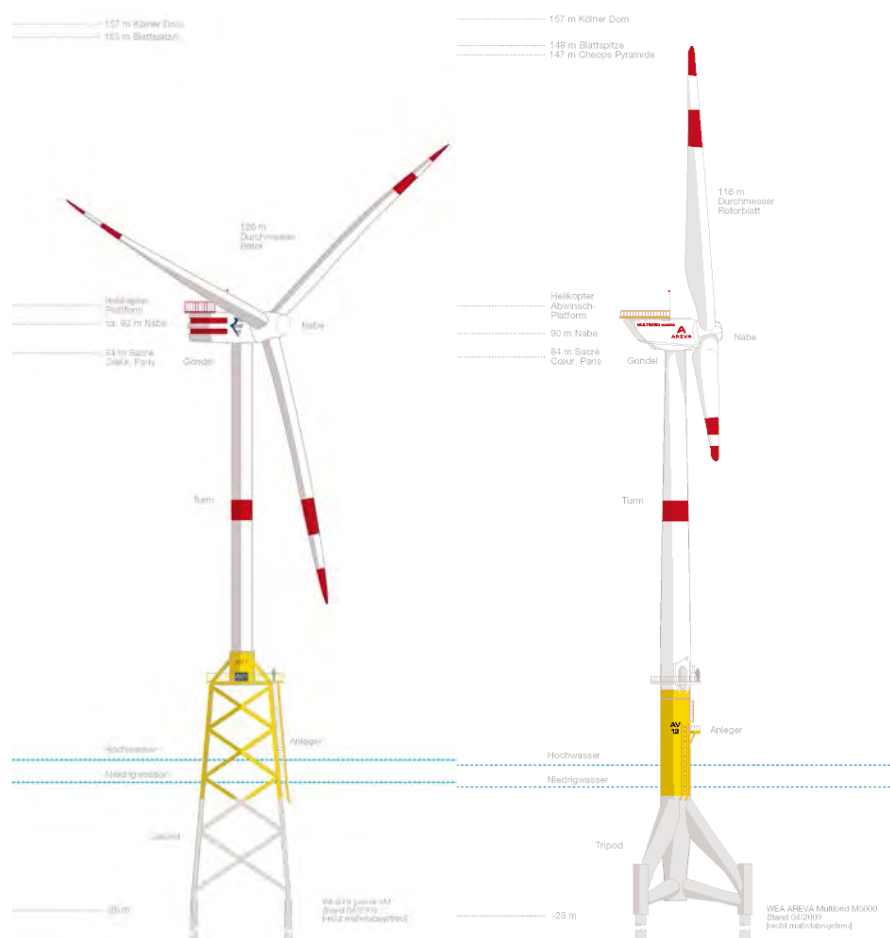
Sketch of REpower 5M with a jacket foundation (left); AREVA Wind M5000 with a tripod.
